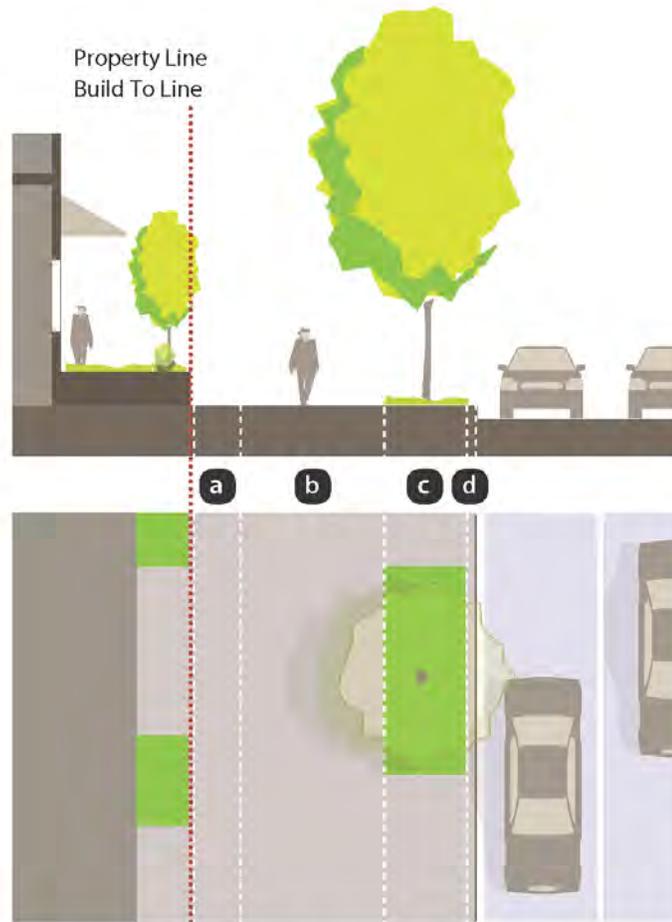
, Golf Club Road Sidewalk Improvements
